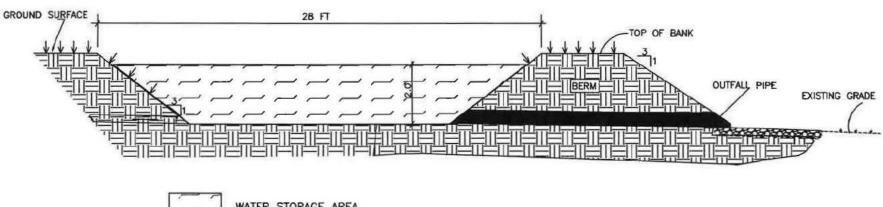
TYPICAL CROSS-SECTION OF PROPOSED DETENTION BASIN
